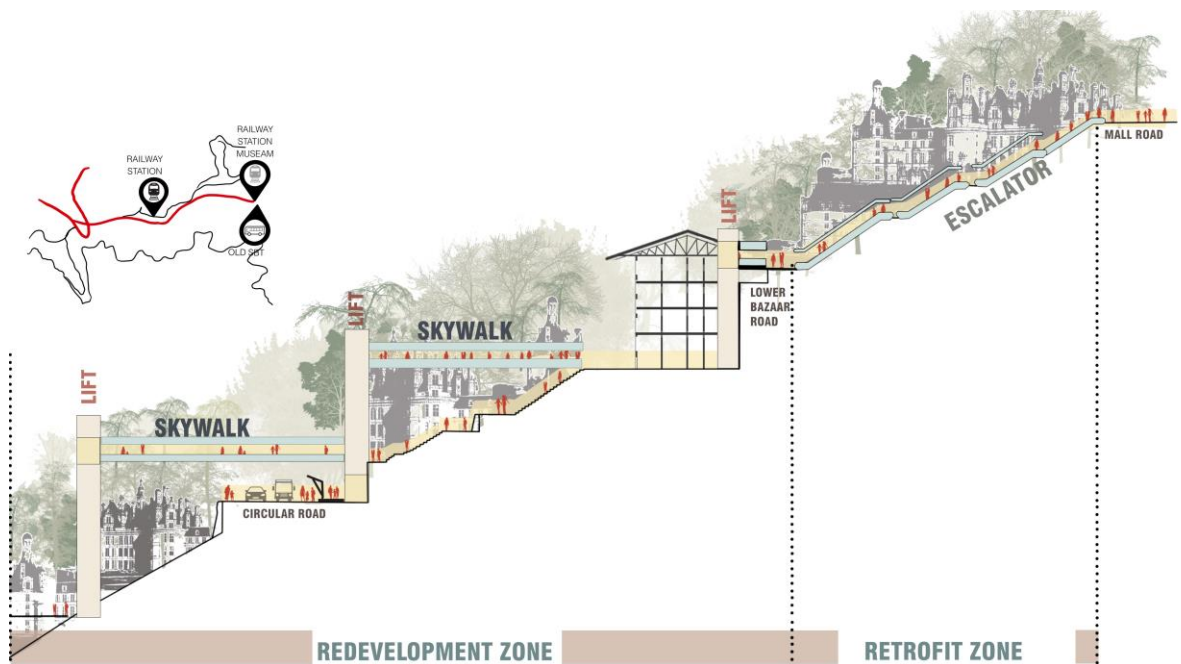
Redevelopment zone & Retrofit Zone Sectio
